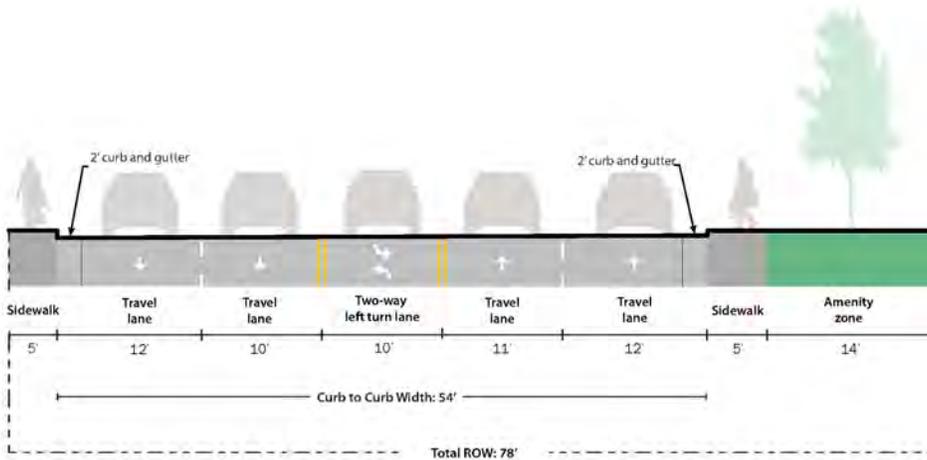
Section J (72nd Avenue West of Bryant Street – Looking East)
